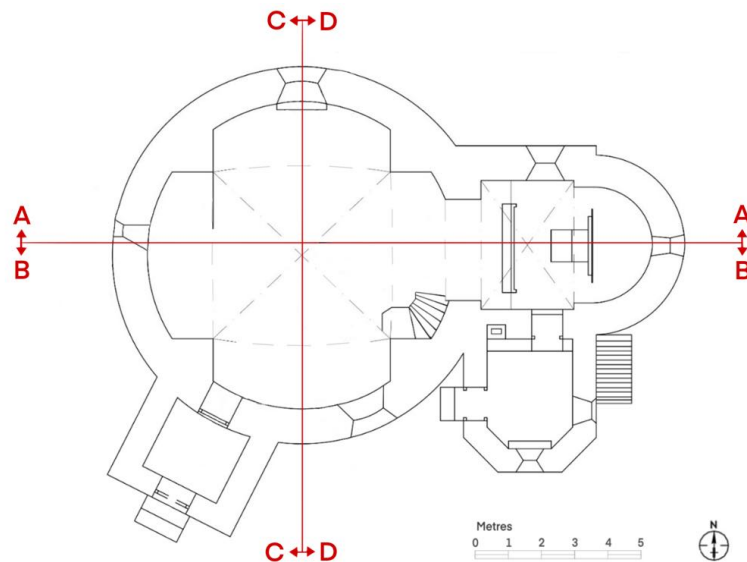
Plan view of the church layout showing sections A (north), B (south), C (west) and D (east)
